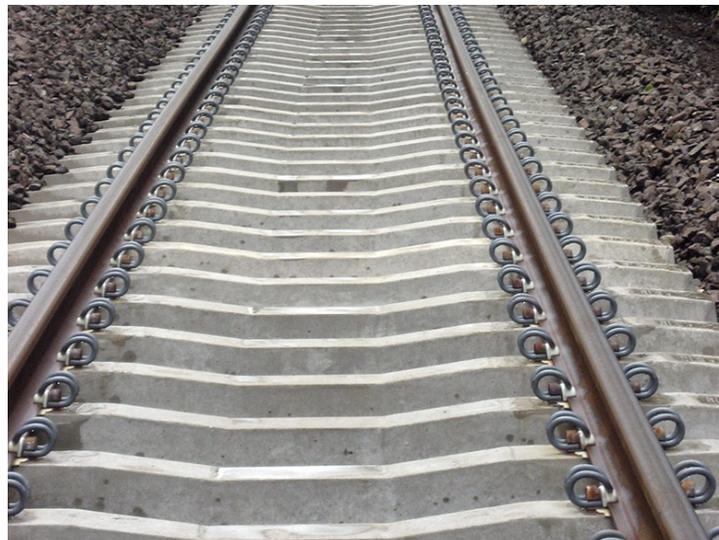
A section of the rail road with sleepers that have reinforcement with braided prestressing wires (source: [5])
